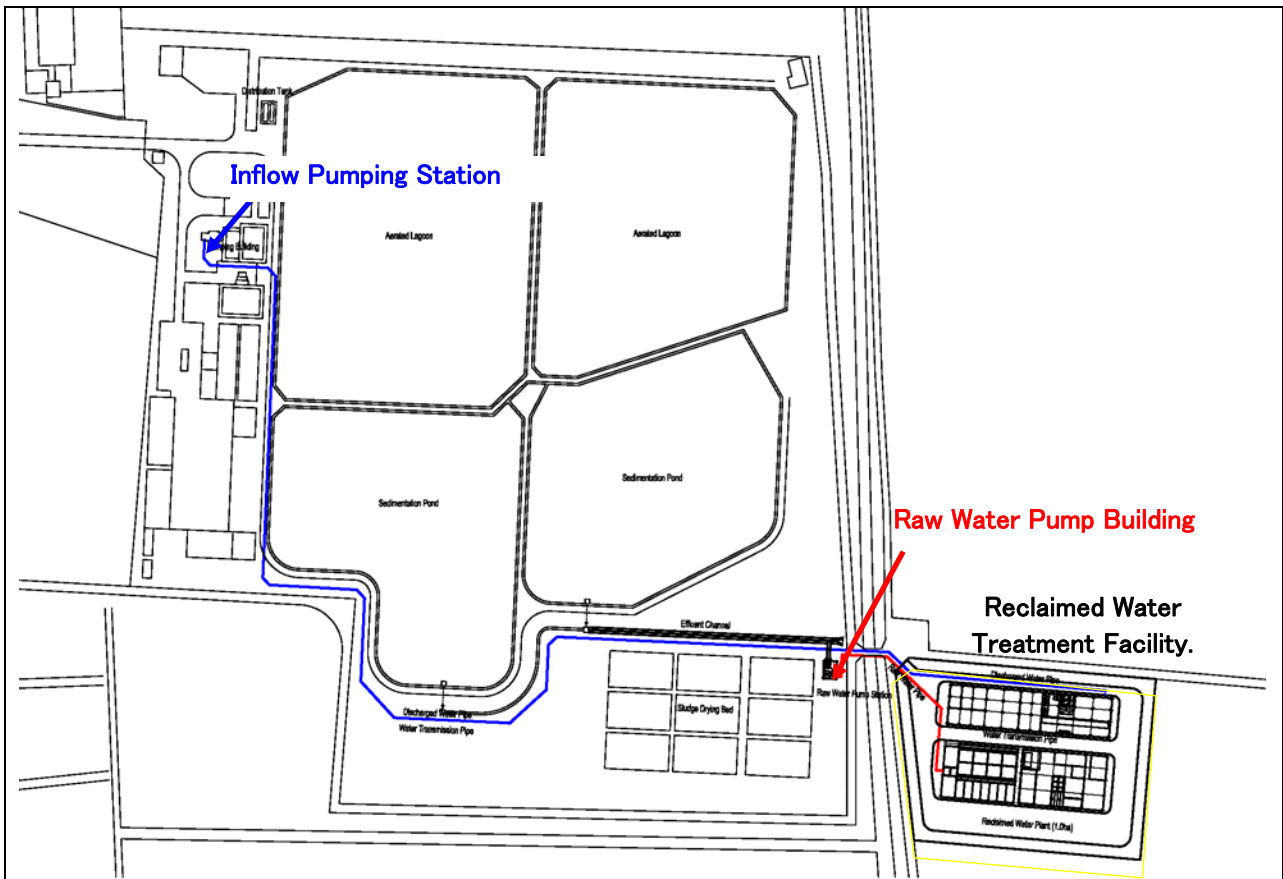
Layout of Raw Water Pipe and Drain Pipe
